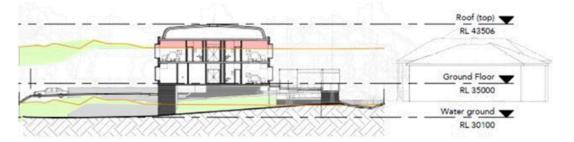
Section D with 8 metre projected existing ground plane (Source: Team 2 Architects)
